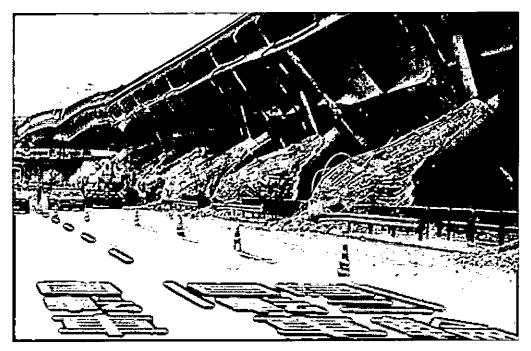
Pier Failure of a Flyover Bridge due to Earthquake
